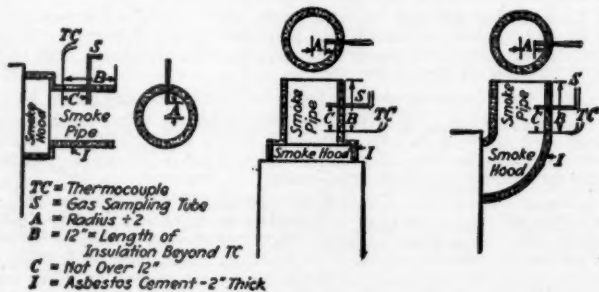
LOCATION OF GAS TEMPERATURE THERMOCOUPLE AND GAS SAMPLING TUBE
